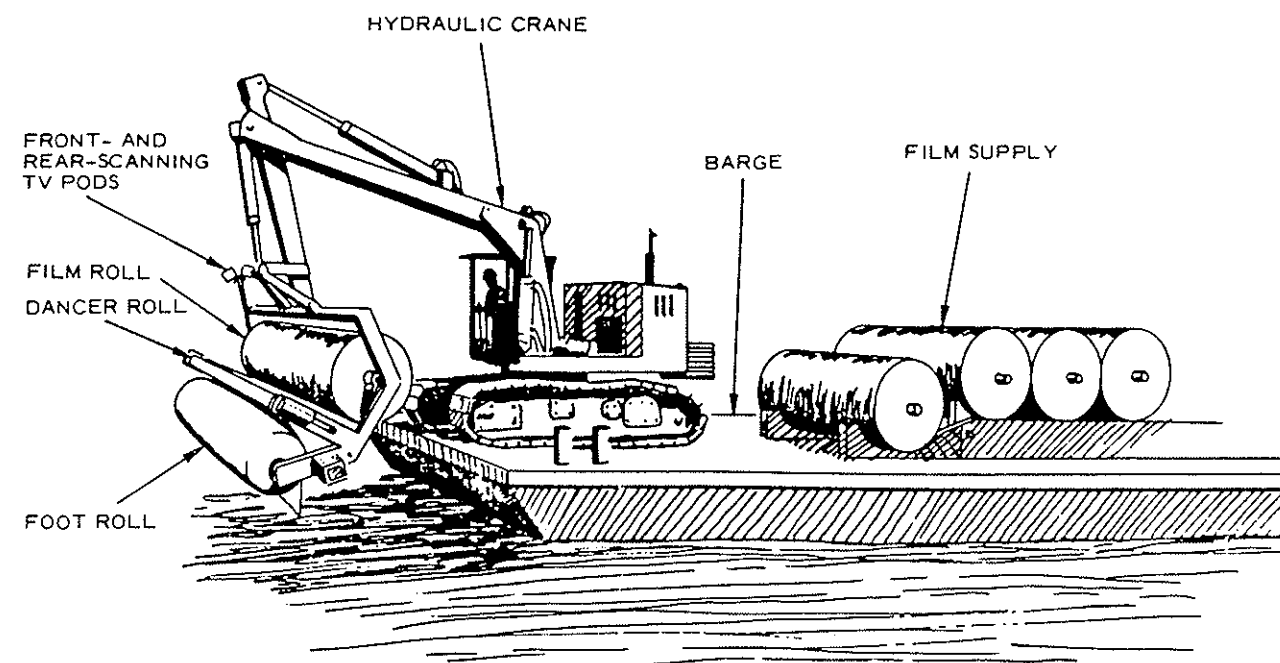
DECK ARRANGEMENT FOR BARGE-MOUNTED ROLLER APPARATUS
